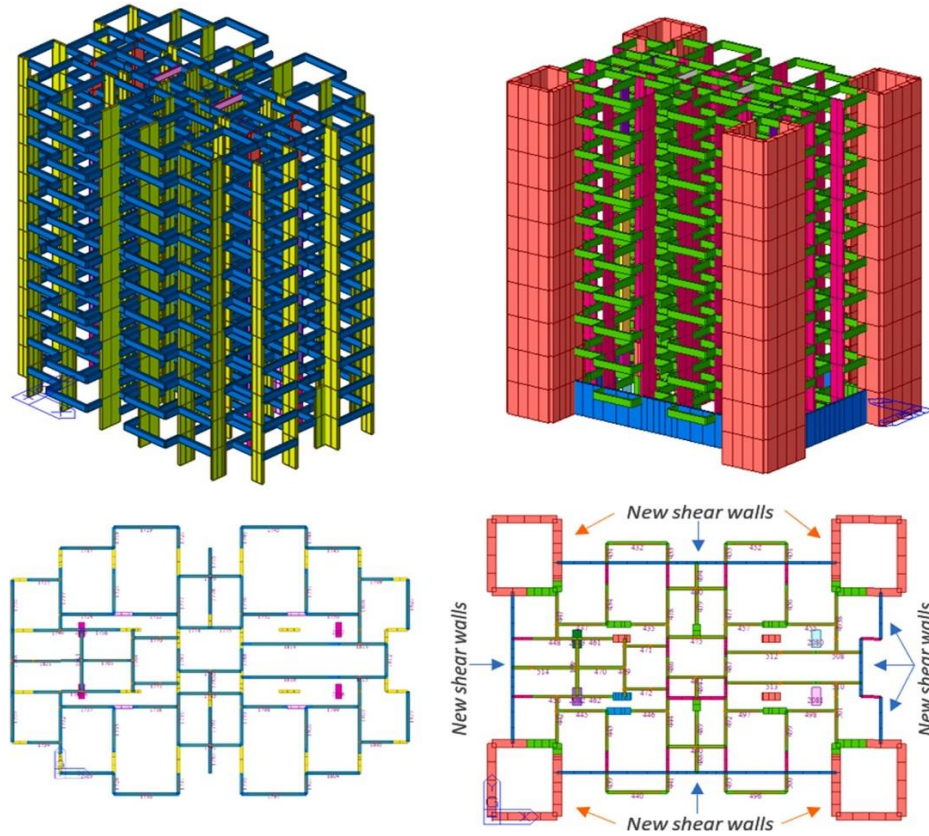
Original Building Model and Building Model with new Shear Walls (Cosgun T et al (2022))
